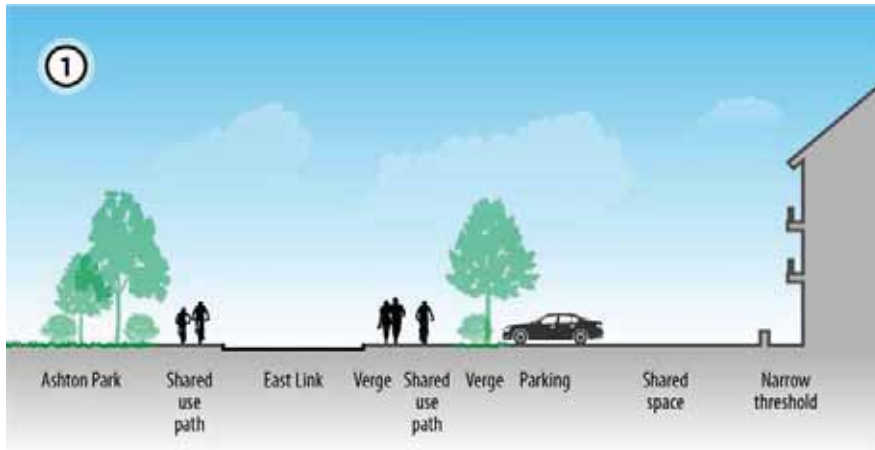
Indicative Street Section 1: East Link facing Ashton Burn Park.
